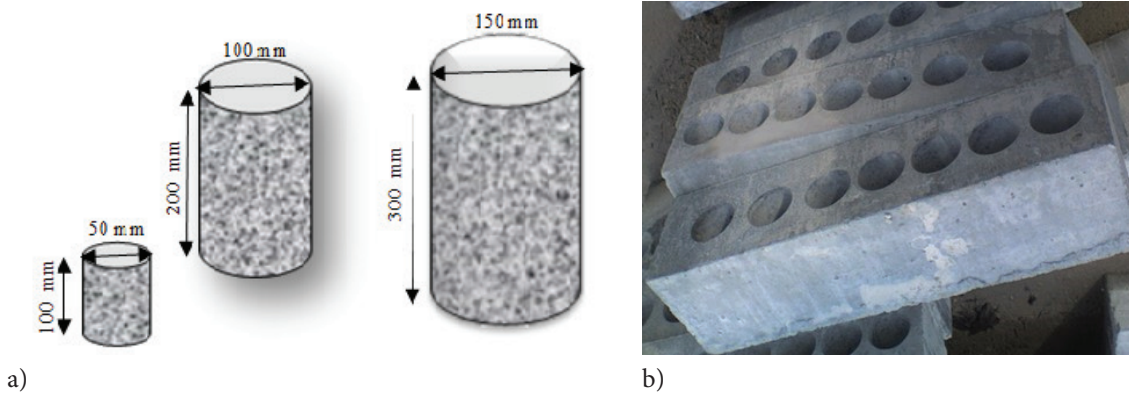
Tested concretes: (a) Cast specimen, (b) Concrete blocks for core drilling.
